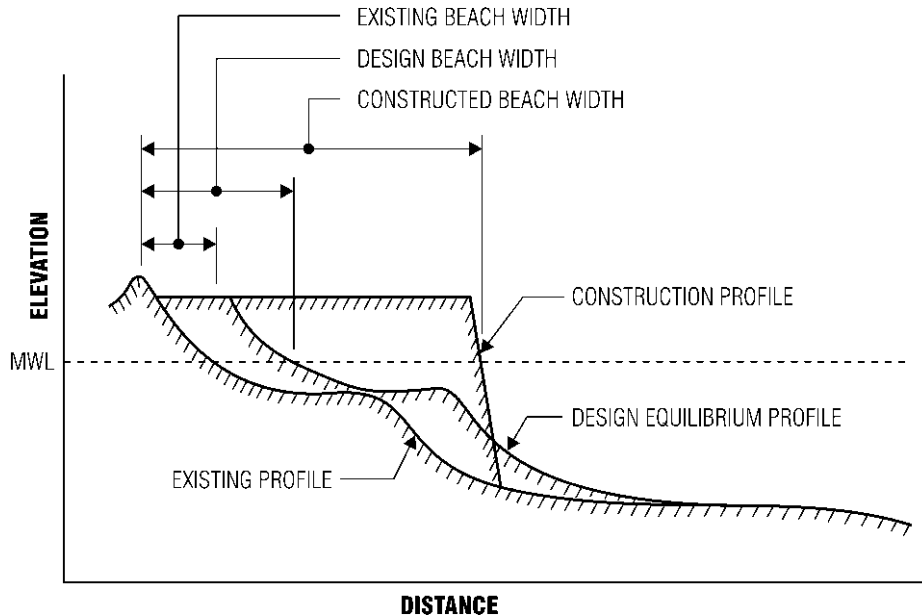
Vertical cross section through a beach showing the existing beach profile, beachfill construction profile, and the effects of the cross-shore equilibration process.
